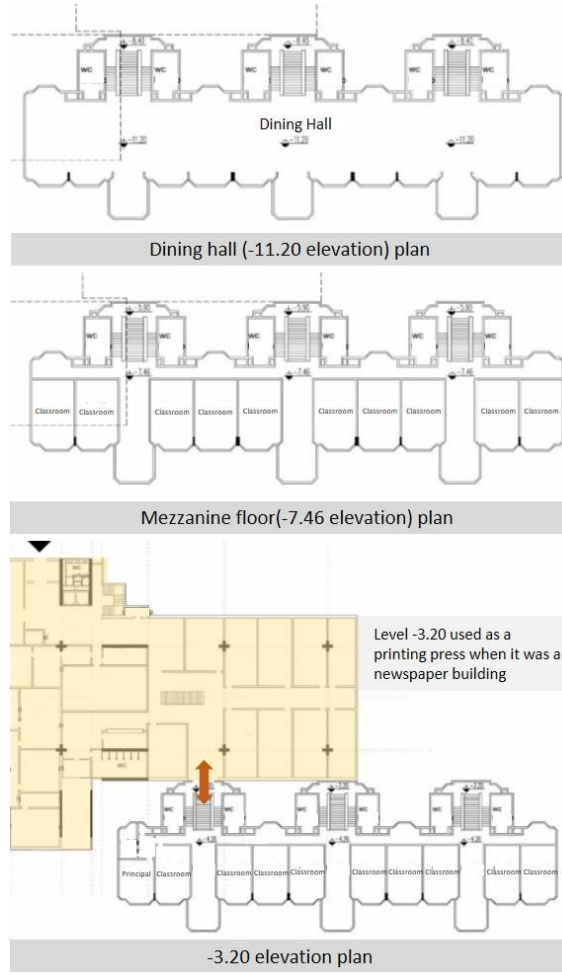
Annex building floor plans [Accessed from plans (Kaymak, 2019)]
